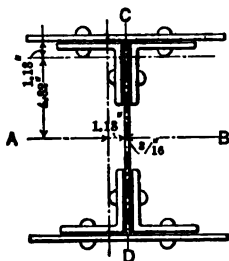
Least Radius of Gyration of Cross-section of Plate-and-angle Column
